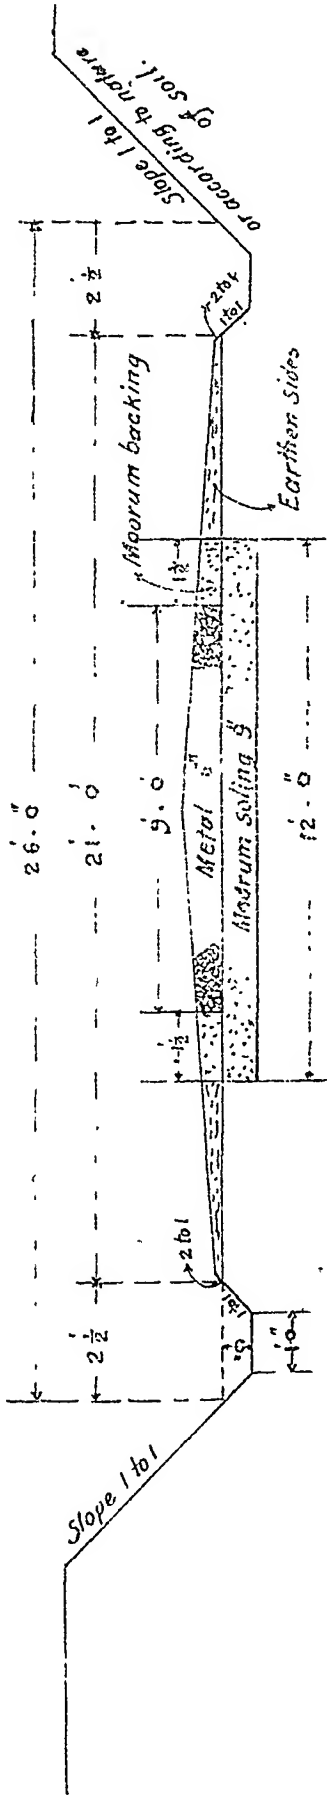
DETAILED TYPE CROSS SECTION OF ROAD IN EMBANKMENT
